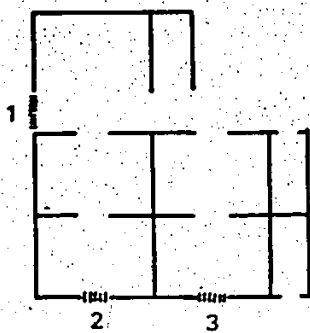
PLAN OF A CROSS-SHAPED BUILDING
